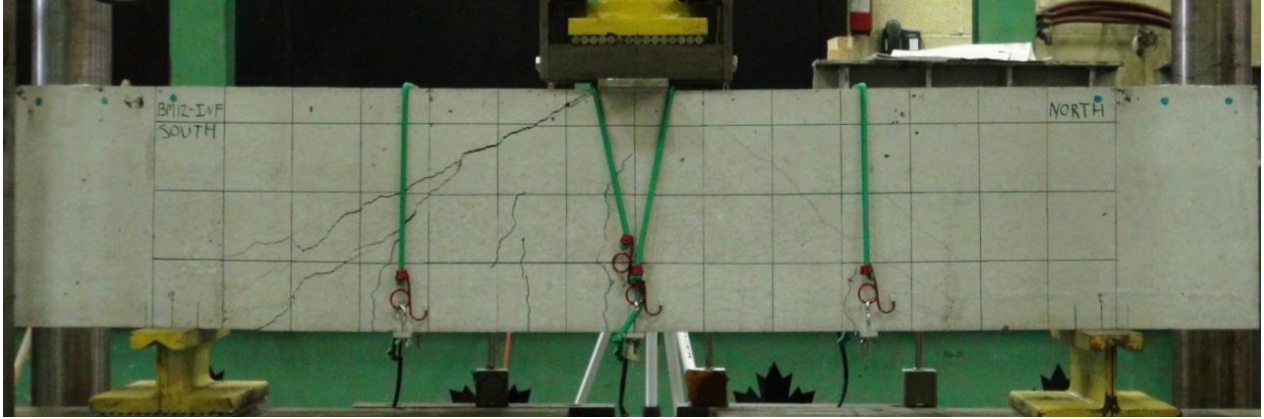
Typical Failure Mode for Beams with No Stirrups
